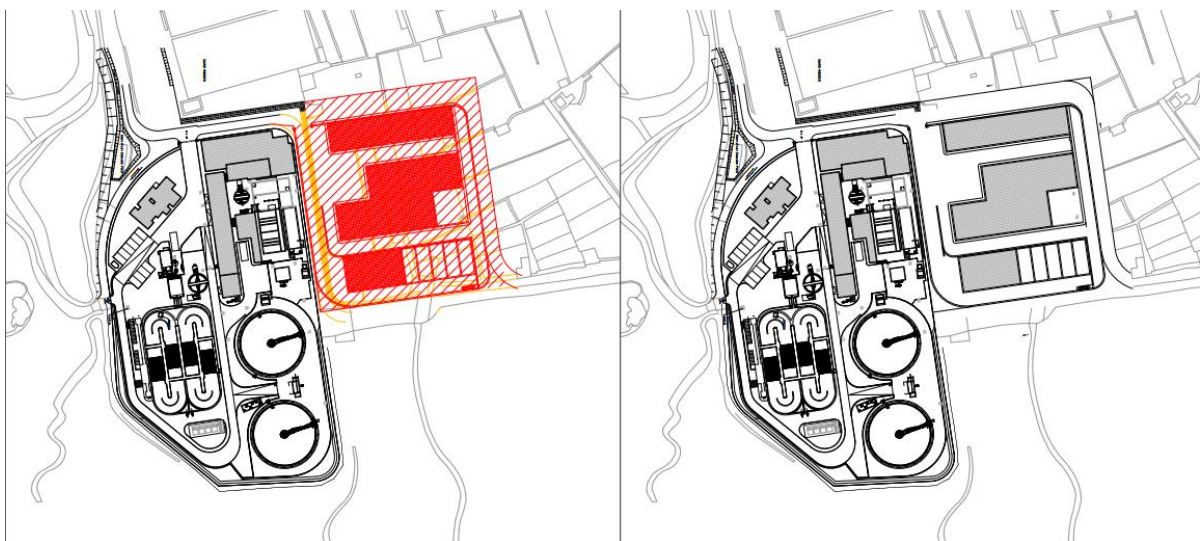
Left: Existing/proposed plan, right: proposed plan (Source: TRK289962)
